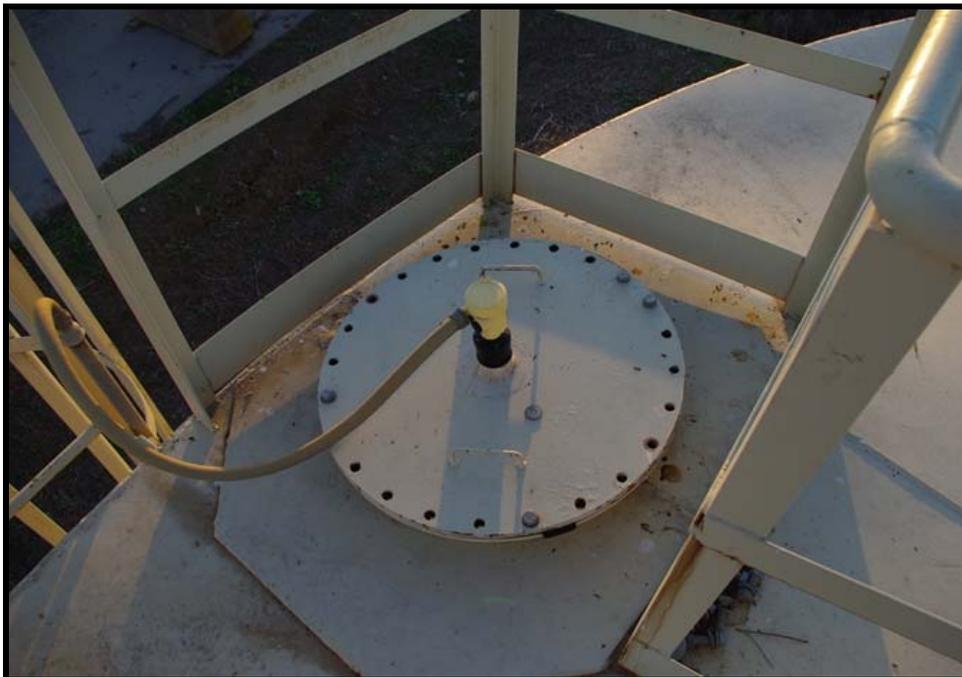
Equipment penetrating roof manhole cover.
